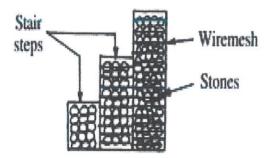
Gabion Retaining Wall with Stair Steps
